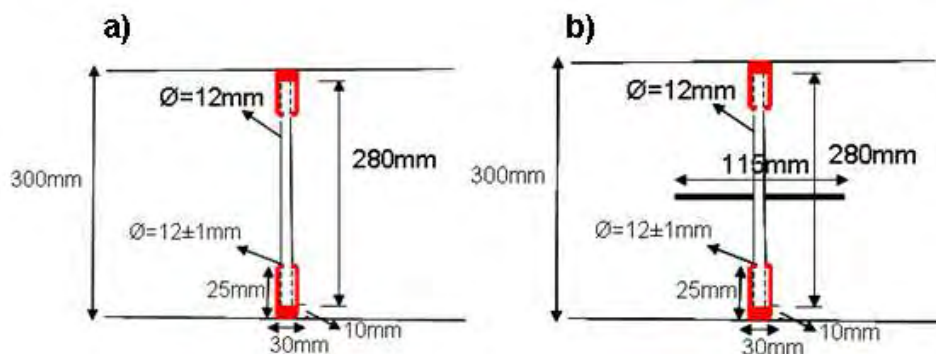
Schematic illustration of the top view of the concrete slabs of a) single bar configuration (Type I) and b) two crossed rebar configuration (Type II). PVC hooves are marked with red colour.
